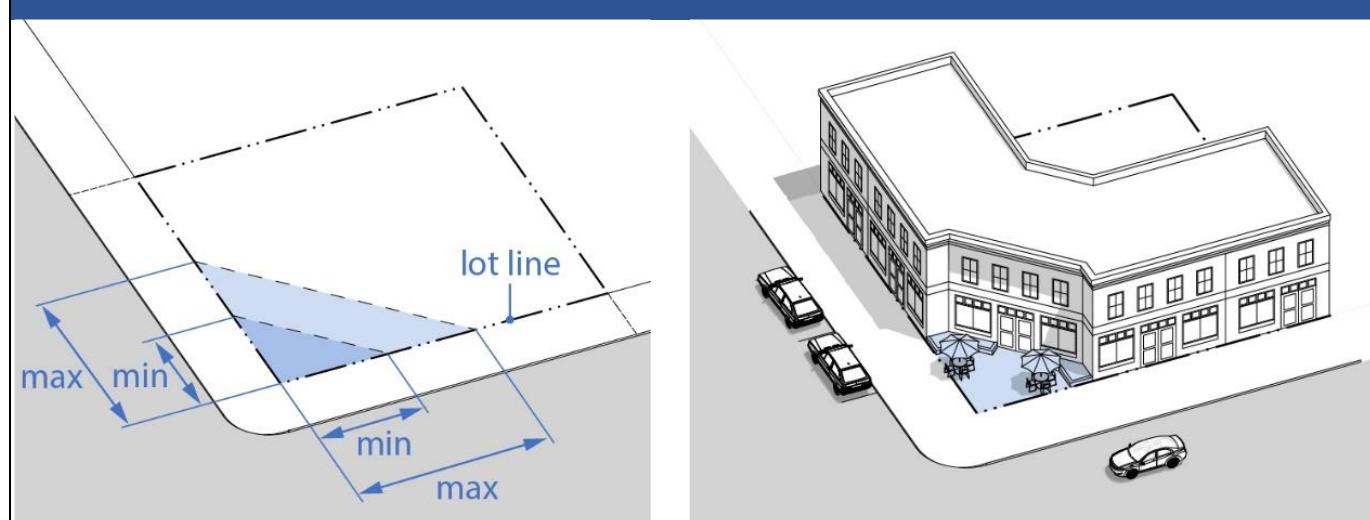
FAÇADE ORIENTATION AND CORNER LOT SITE CLEARANCE
